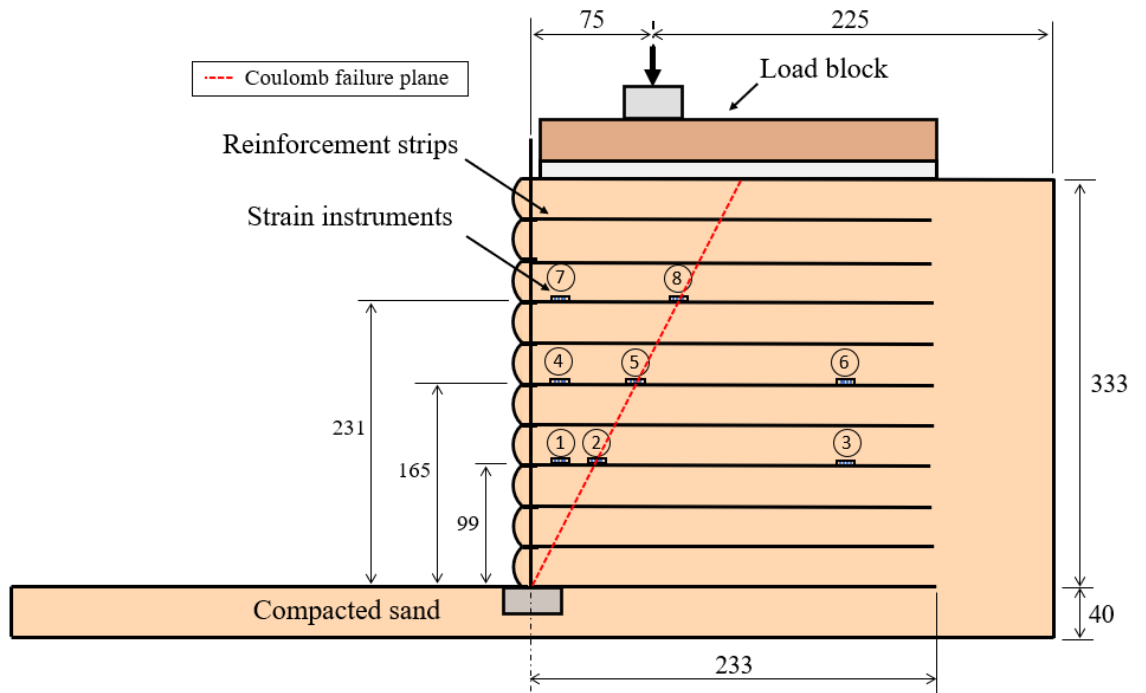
A cross-section of the stress-strain soil wall models. Not drawn-to-scale and all dimensions are in millimetres.
